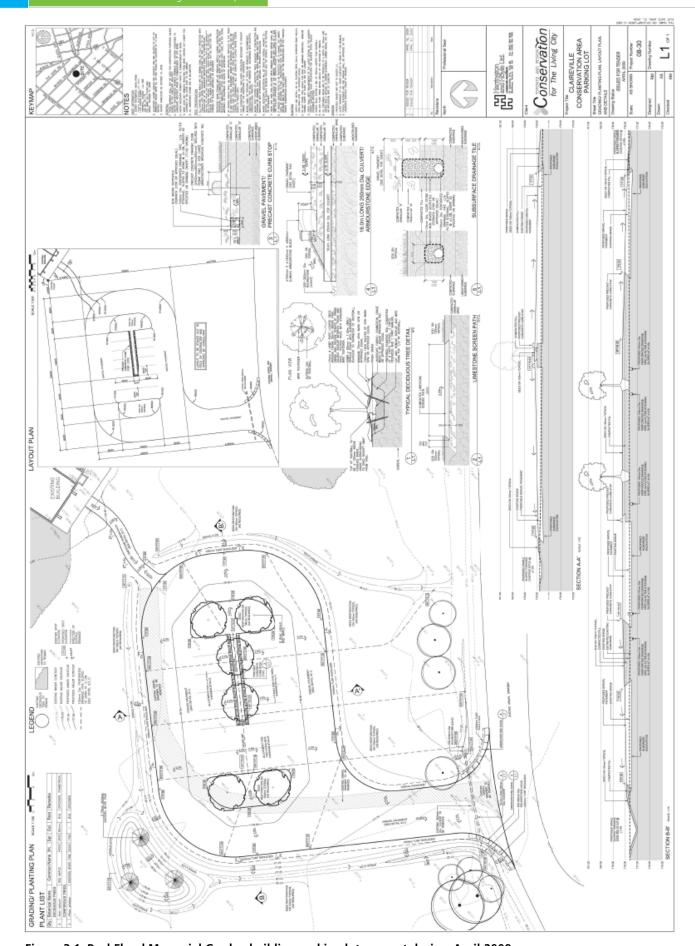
Paul Flood Memorial Garden building parking lot concept design, April 2009
